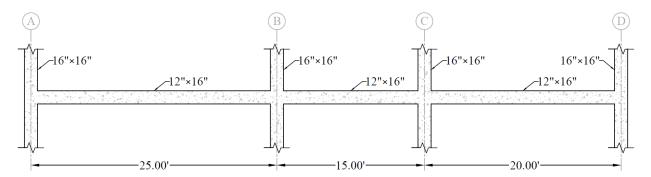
Reinforced Concrete Continuous Beam at Intermediate Floor Level
